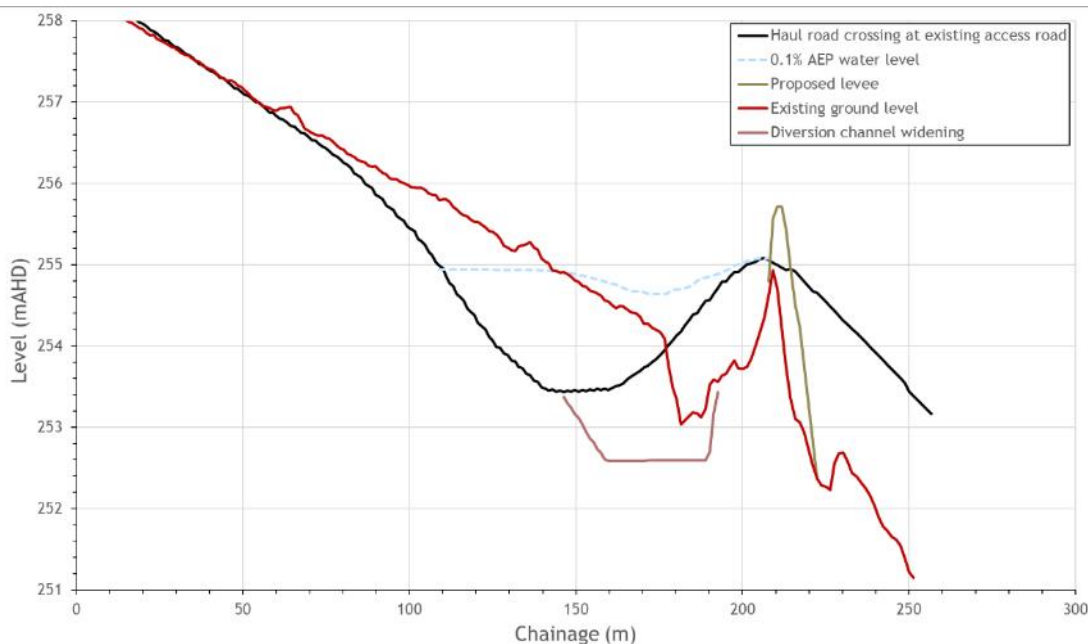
Typical cross section (Access road XS in Figure 8.3) of the proposed levee and drainage diversion modifications at the existing access road haul road crossing upgrade
